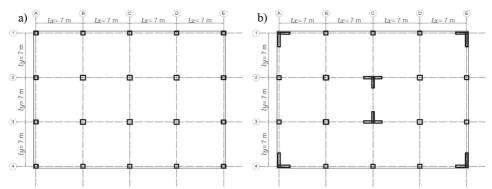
Four story building (4SB). a) Structure without additional shear walls; b) Structure with additional shear walls
